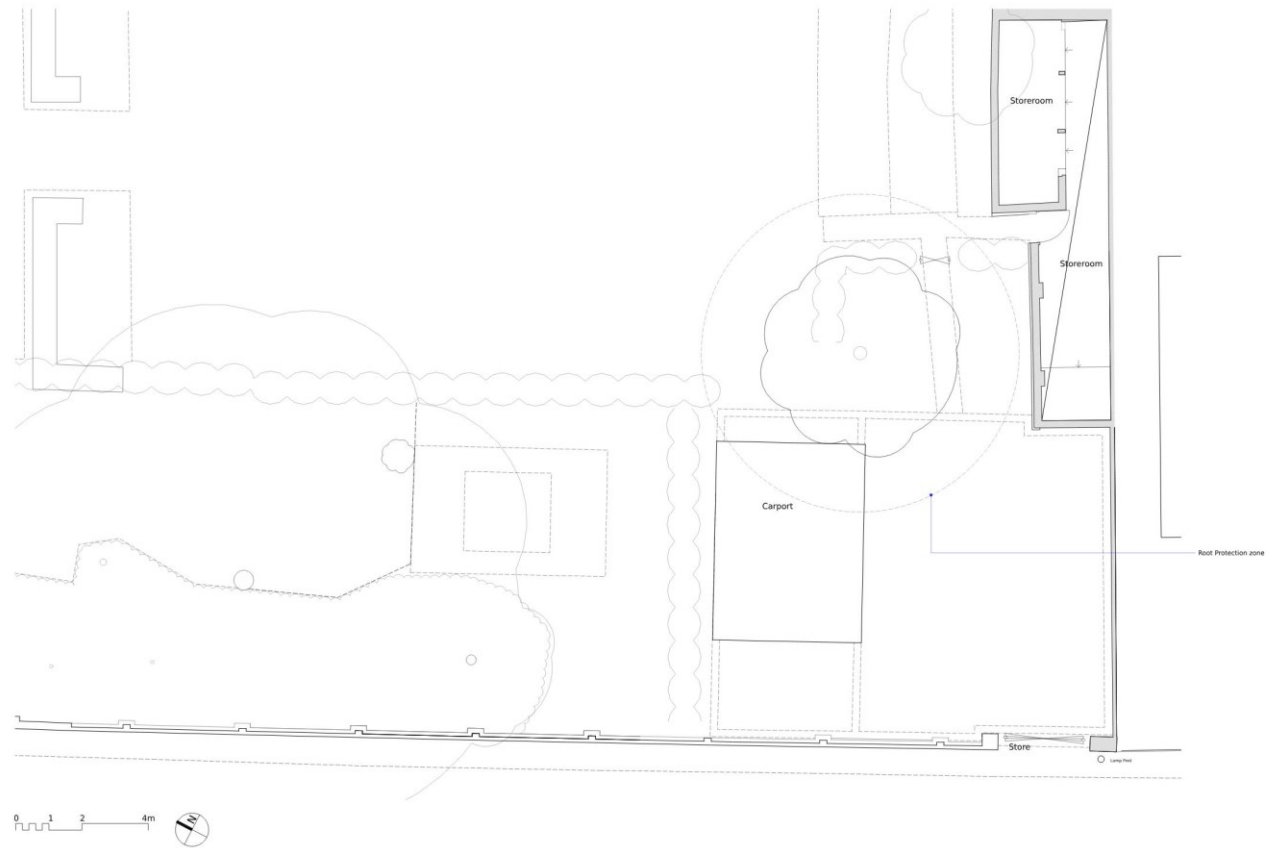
Existing outbuilding plan (reproduced courtesy of the client).
